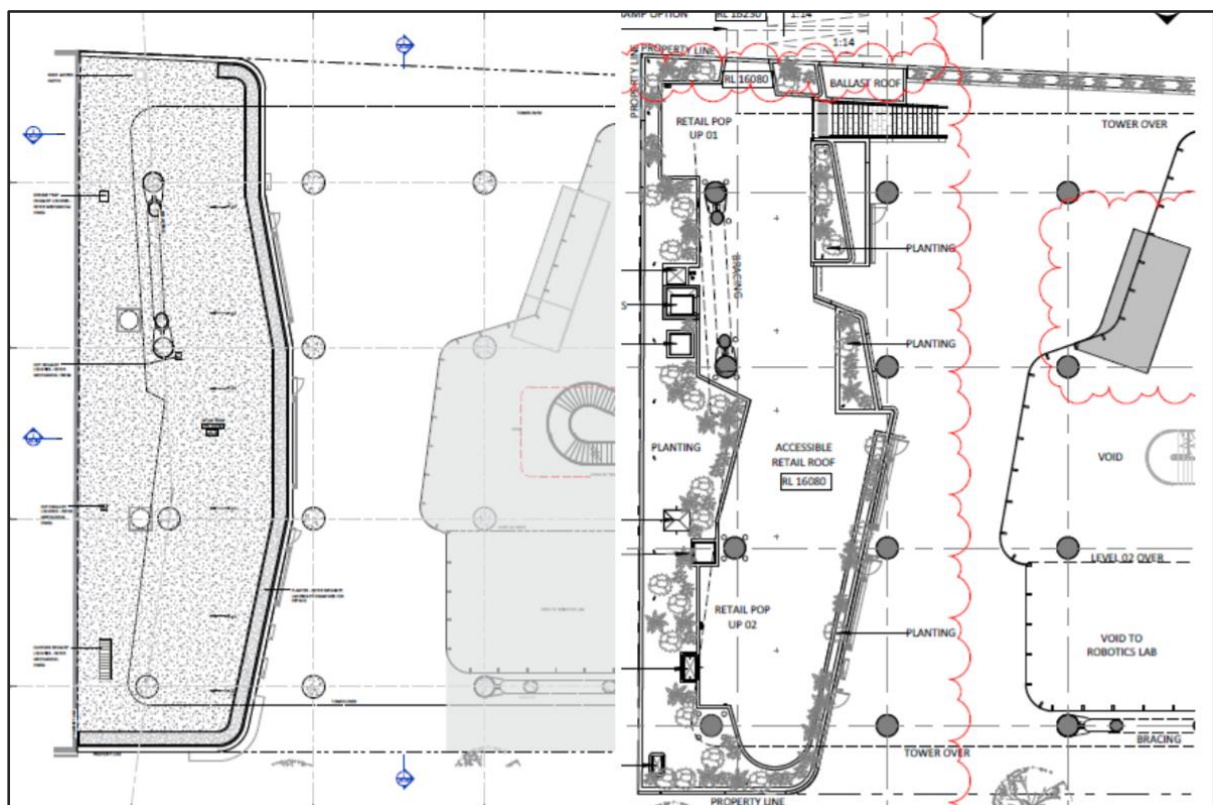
| Approved (Left) and Proposed (Right) Level 1 Plan (Source: Modification Report)
